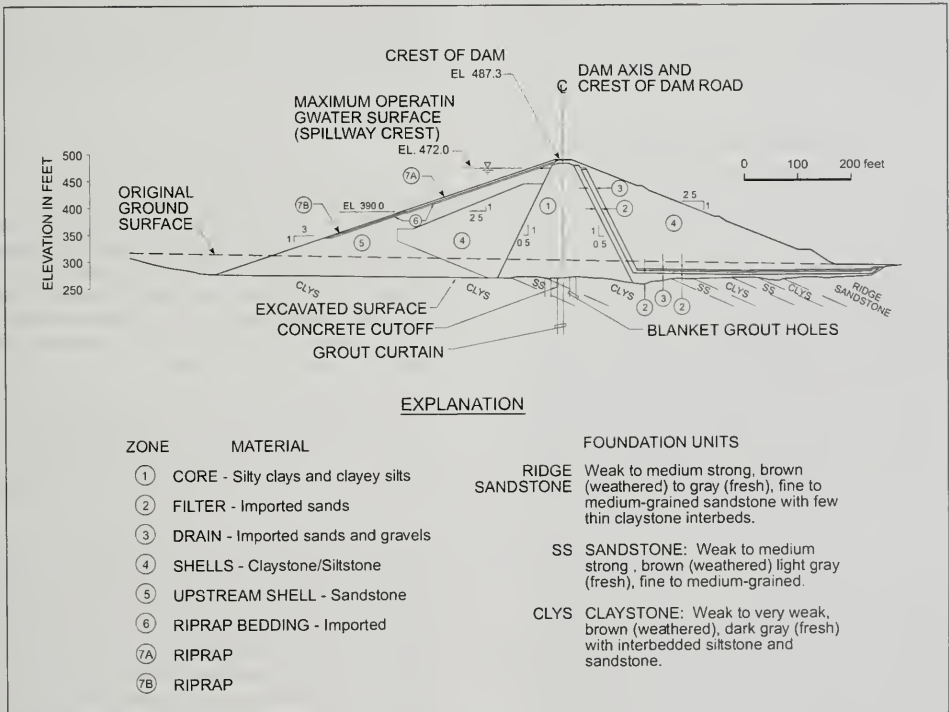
Maximum dam section showing internal embankment zoning and foundation geology.
